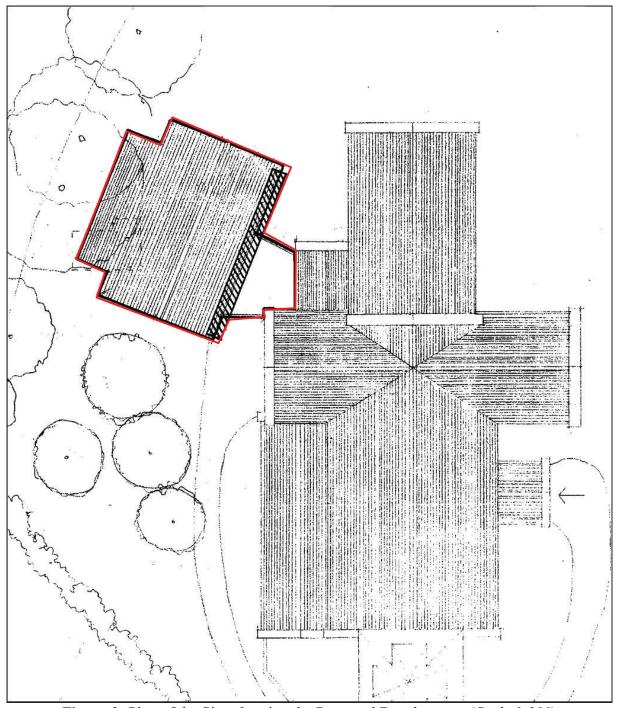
Plan of the Site, showing the Proposed Development (Scale 1:200)
